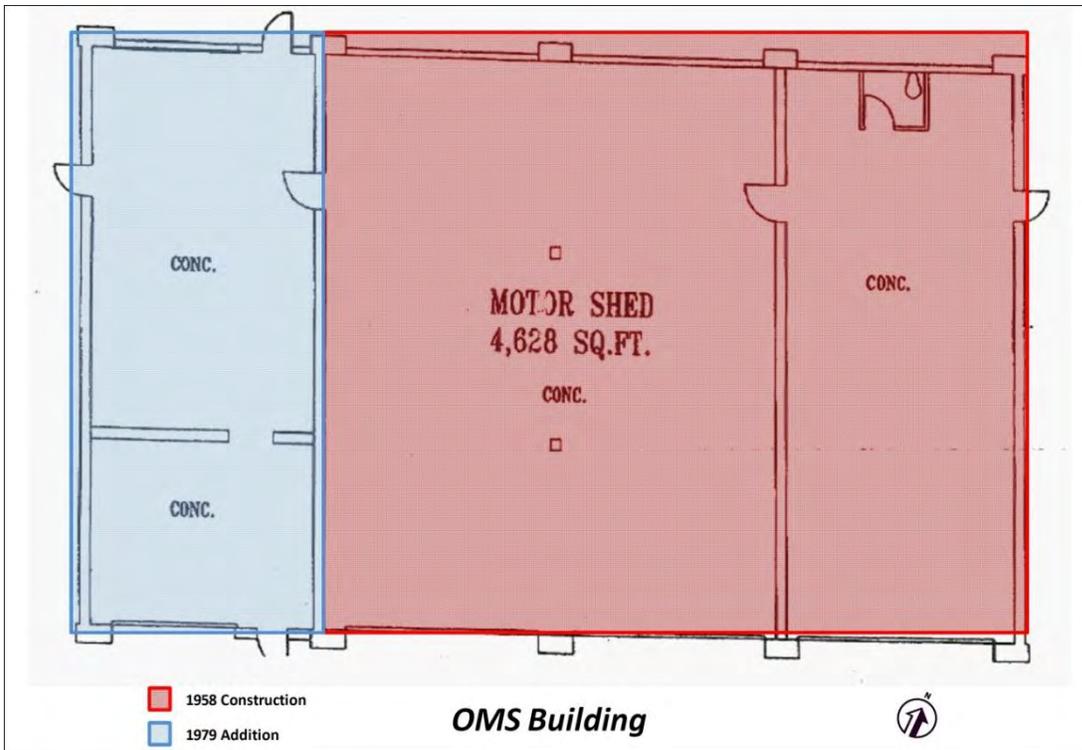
Current architectural floor plan of OMS (altered from ECP [not to scale]).
